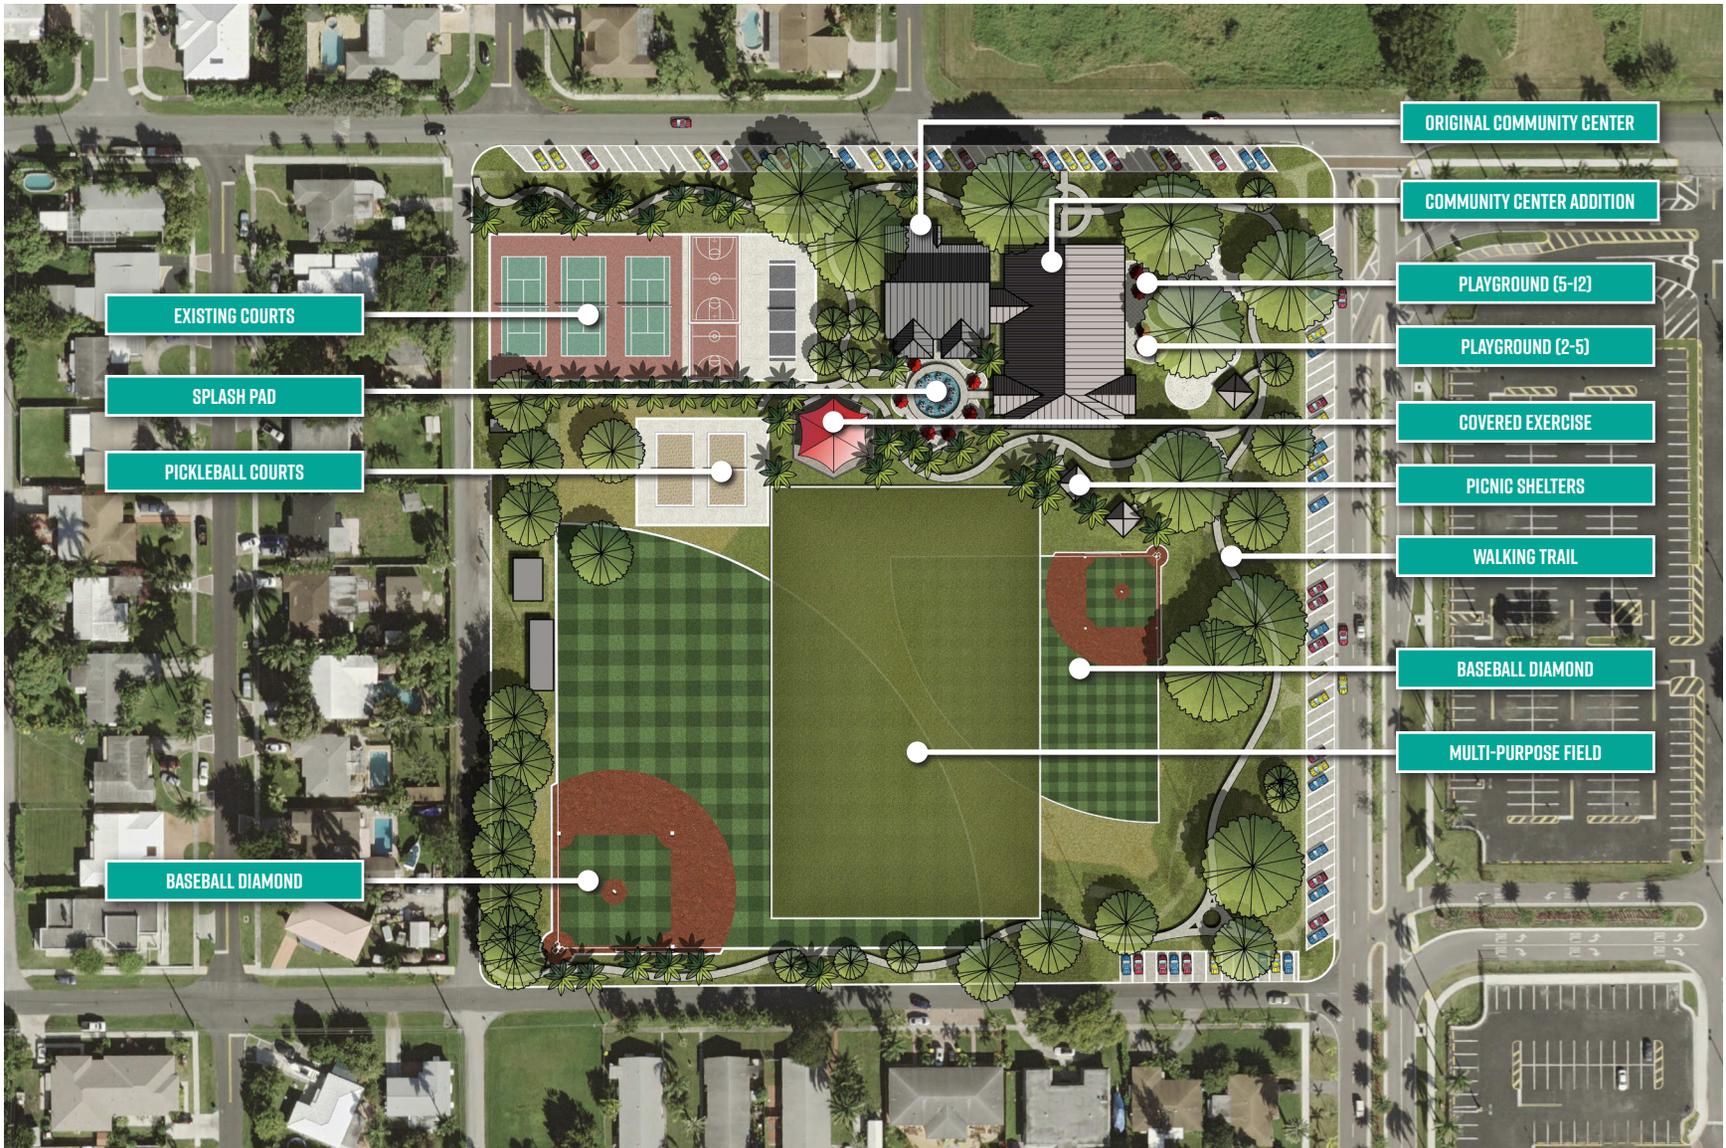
CONCEPT PLAN- FROST PARK CONCEPT PLAN
